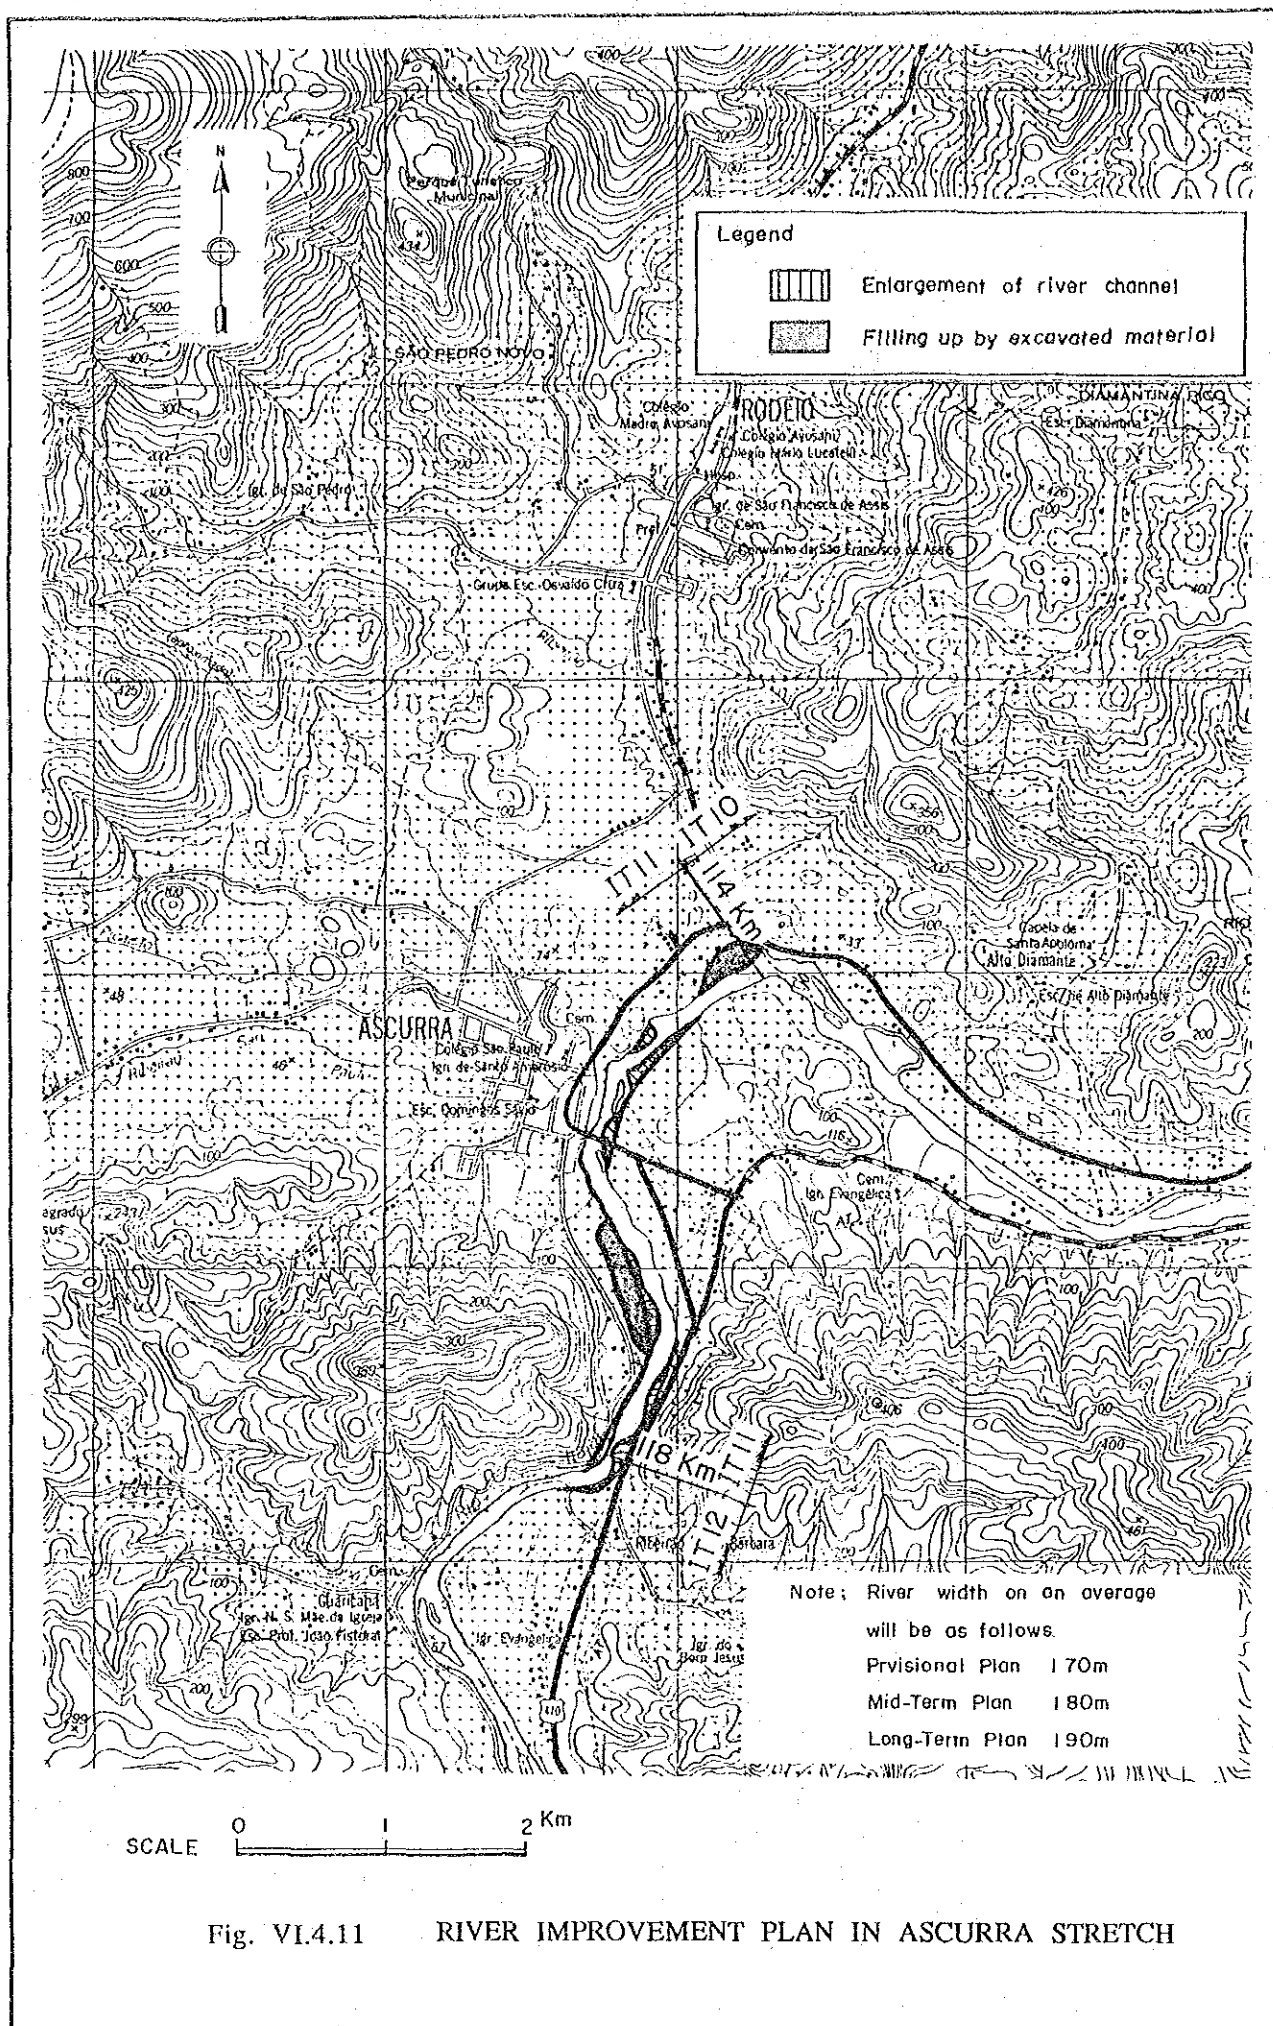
RIVER IMPROVEMENT PLAN IN ASCURRA STRETCH
